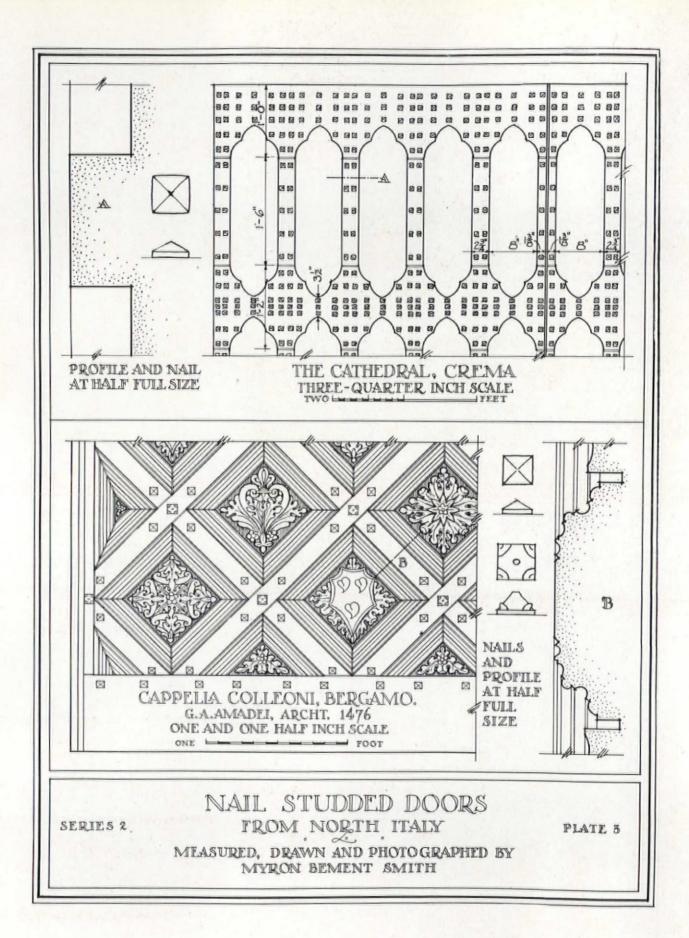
DETAIL OF DOOR, THE CATHEDRAL, CREMA
